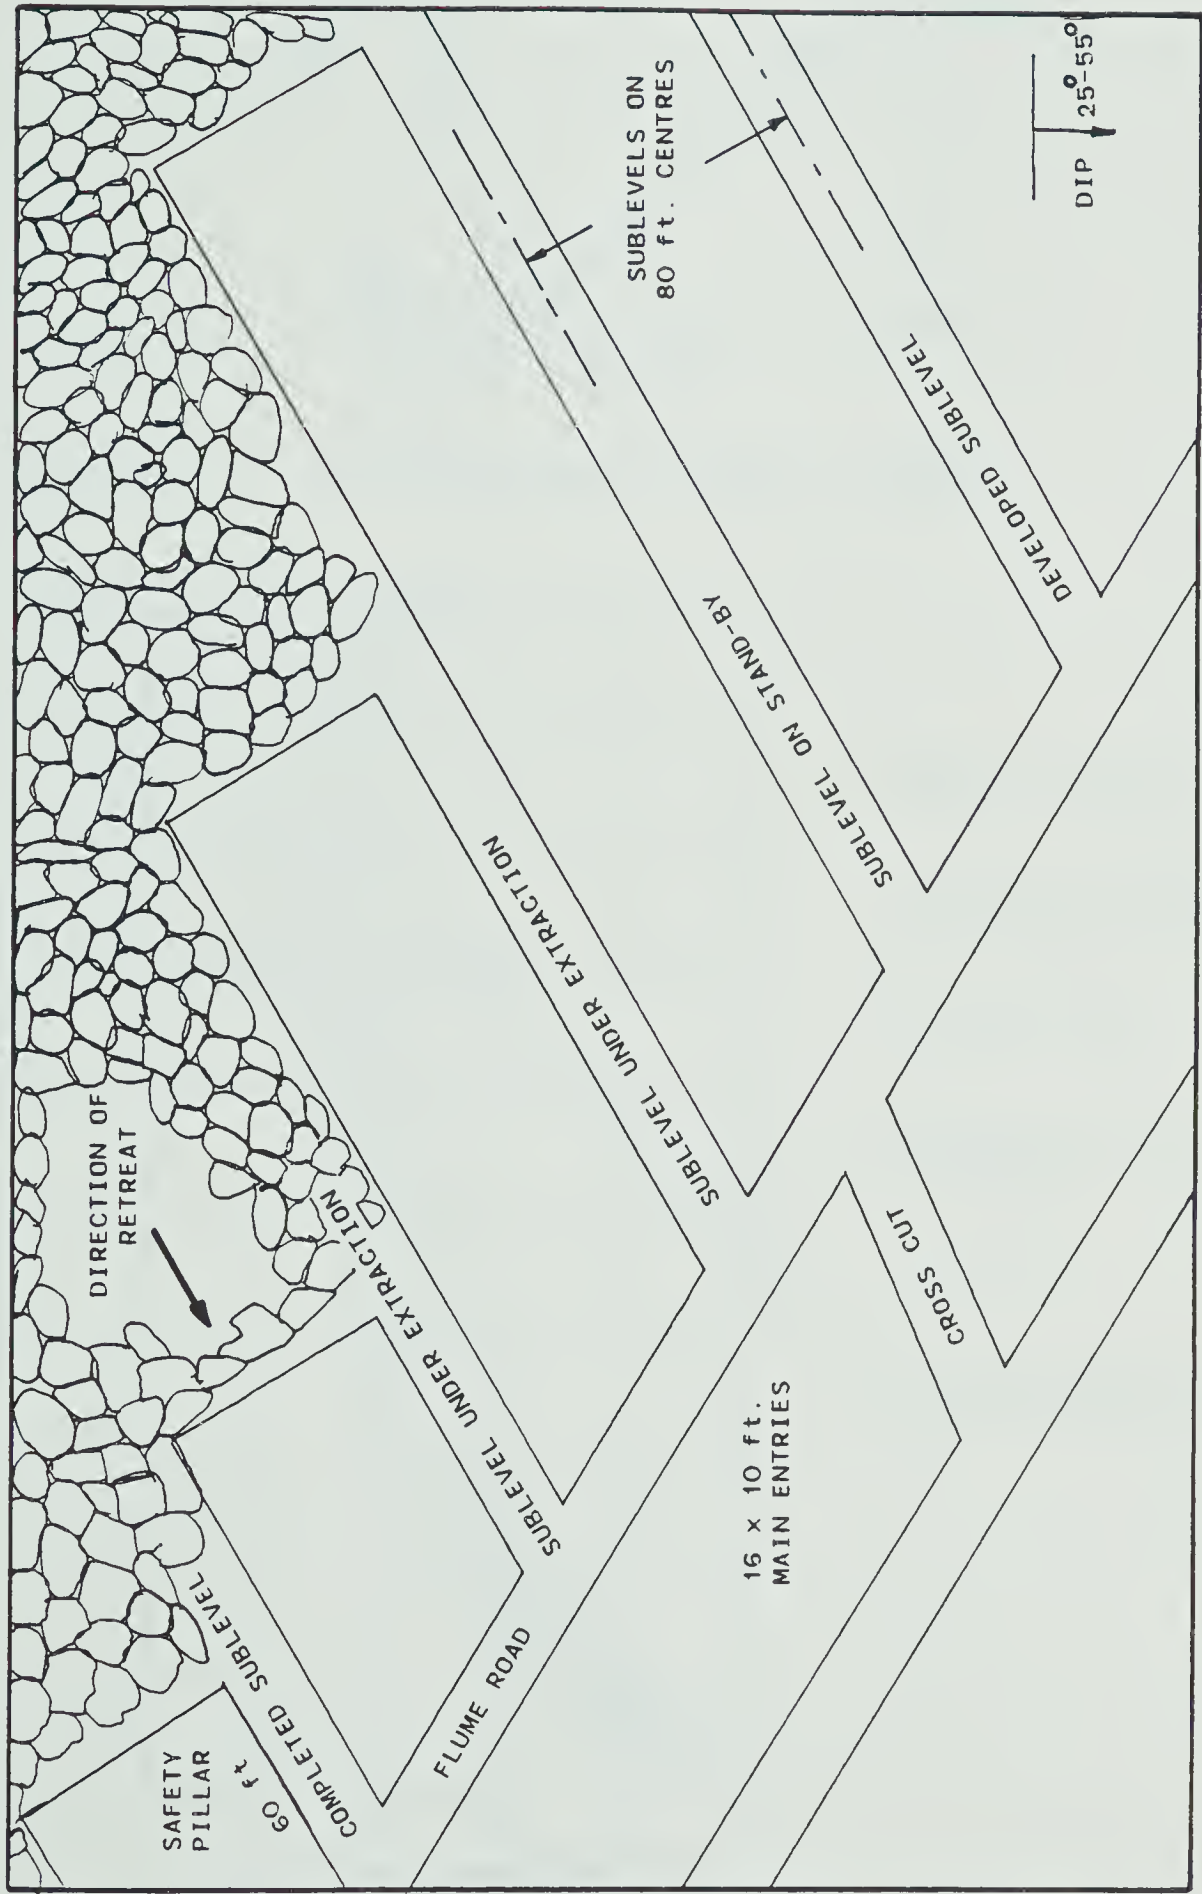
HYDRAULIC MINE SUBLEVEL LAYOUT
